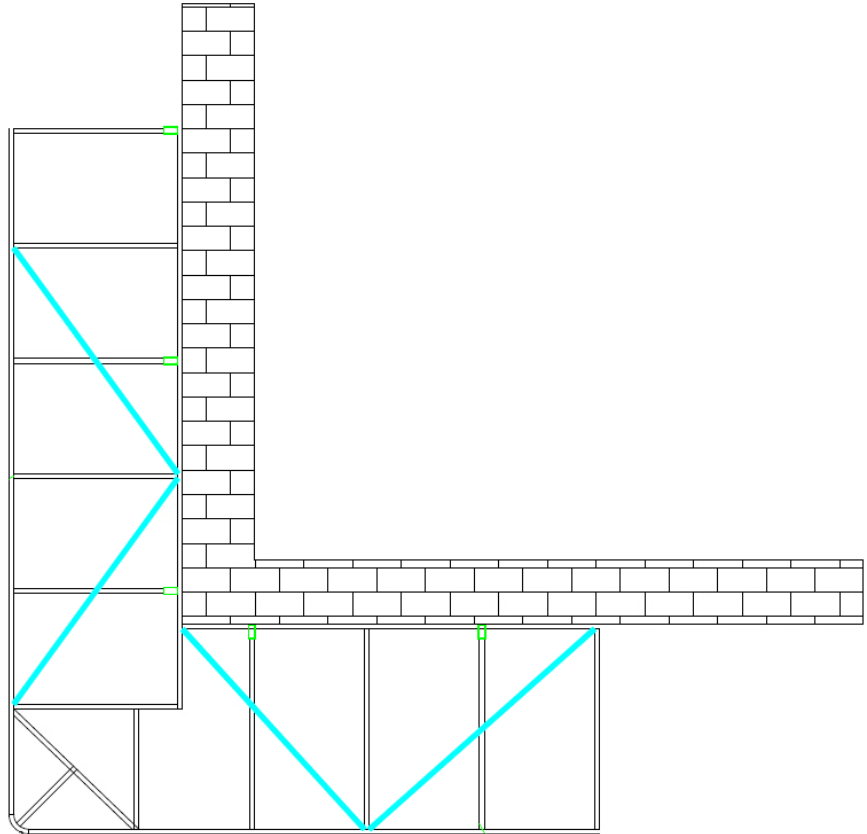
Fix the Rack Frame to the Wall (Top View)
